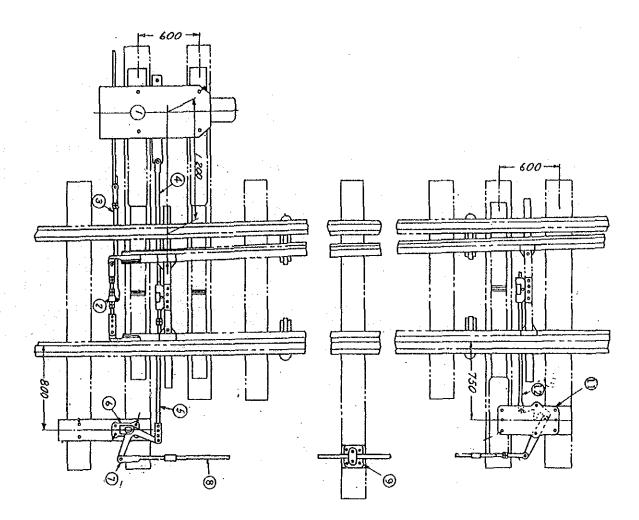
Installation of Locking Device for G-CL Type Point Machine
